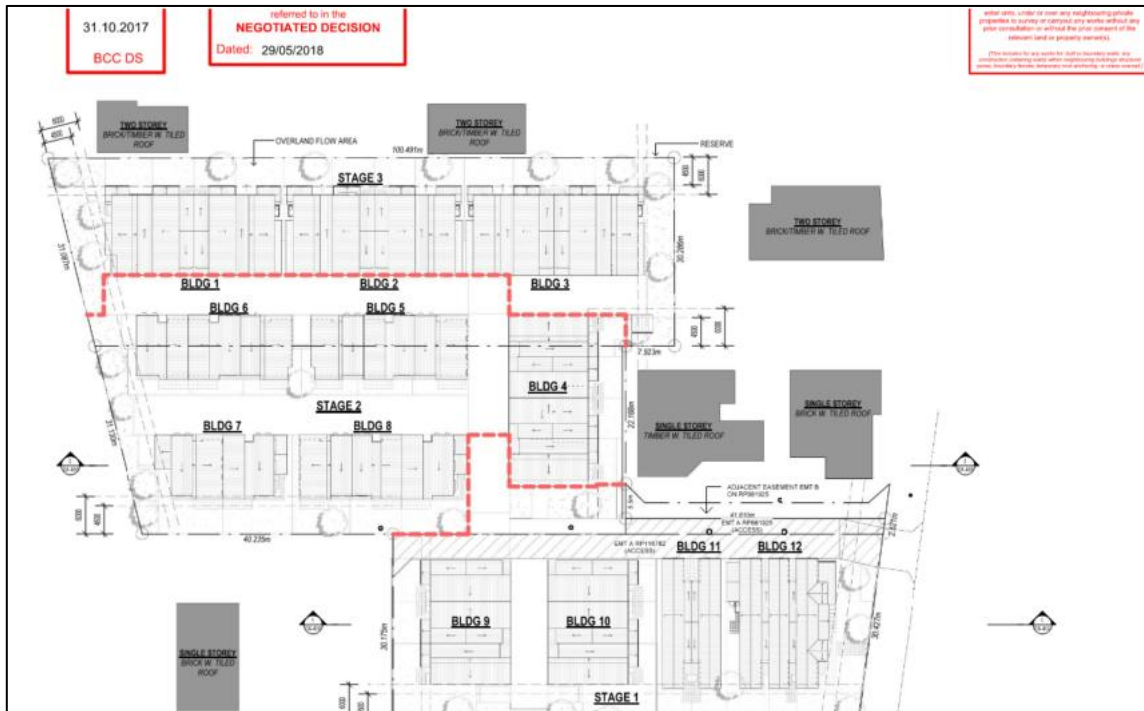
Approved (Overall) Roof Plan. NDN 29.05.2018.
